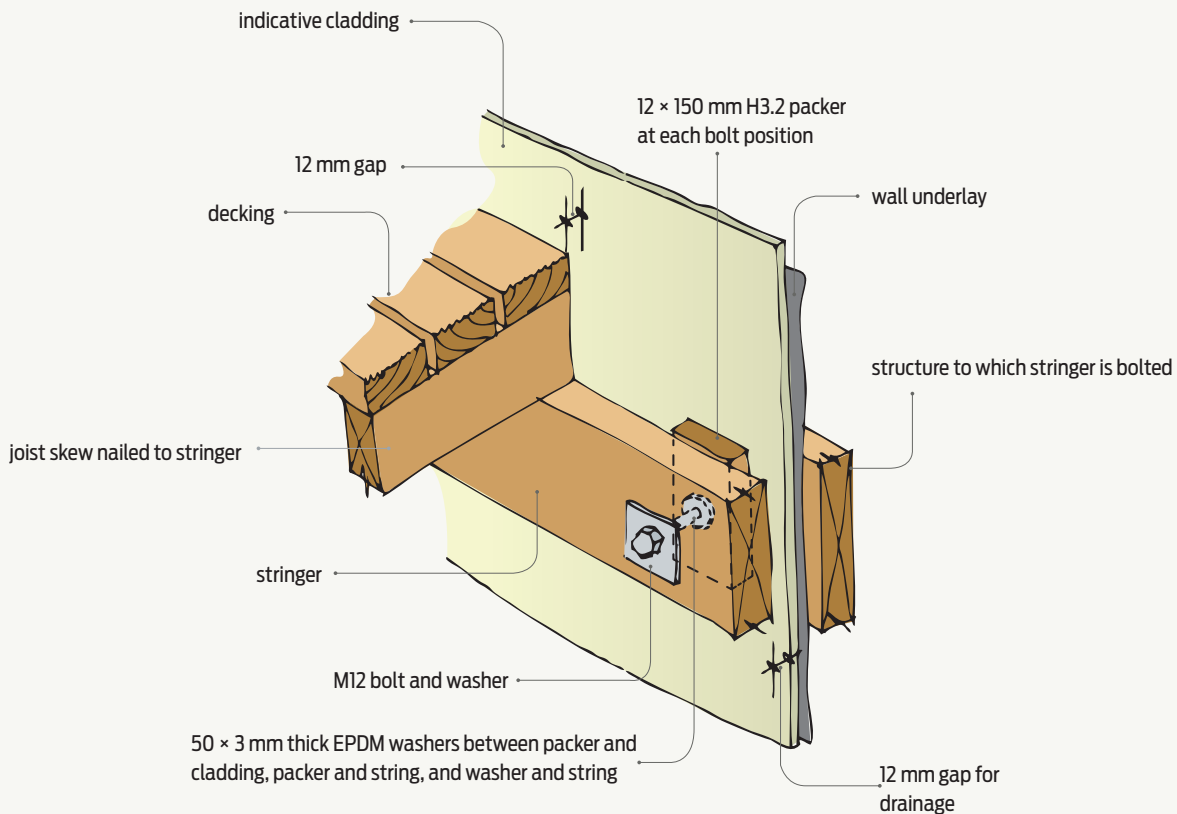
Connection of deck stringer to cladding – direct-fixed.
